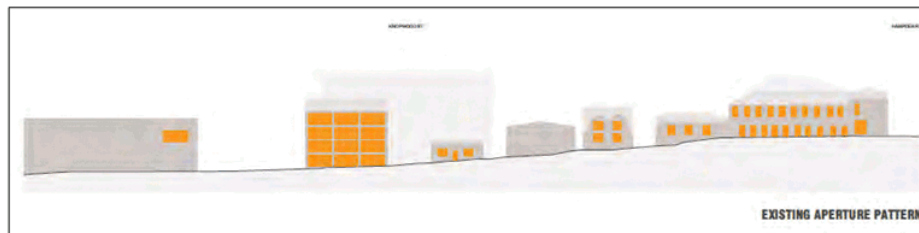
Fenestration of existing buildings along Montpelier Retreat (source: FK Architects)
